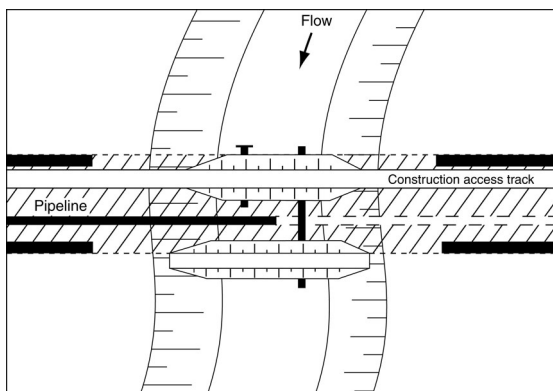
Stage 2 of pipeline installation with the other bypass pipe taken off-line to allow better access for pipe installation
